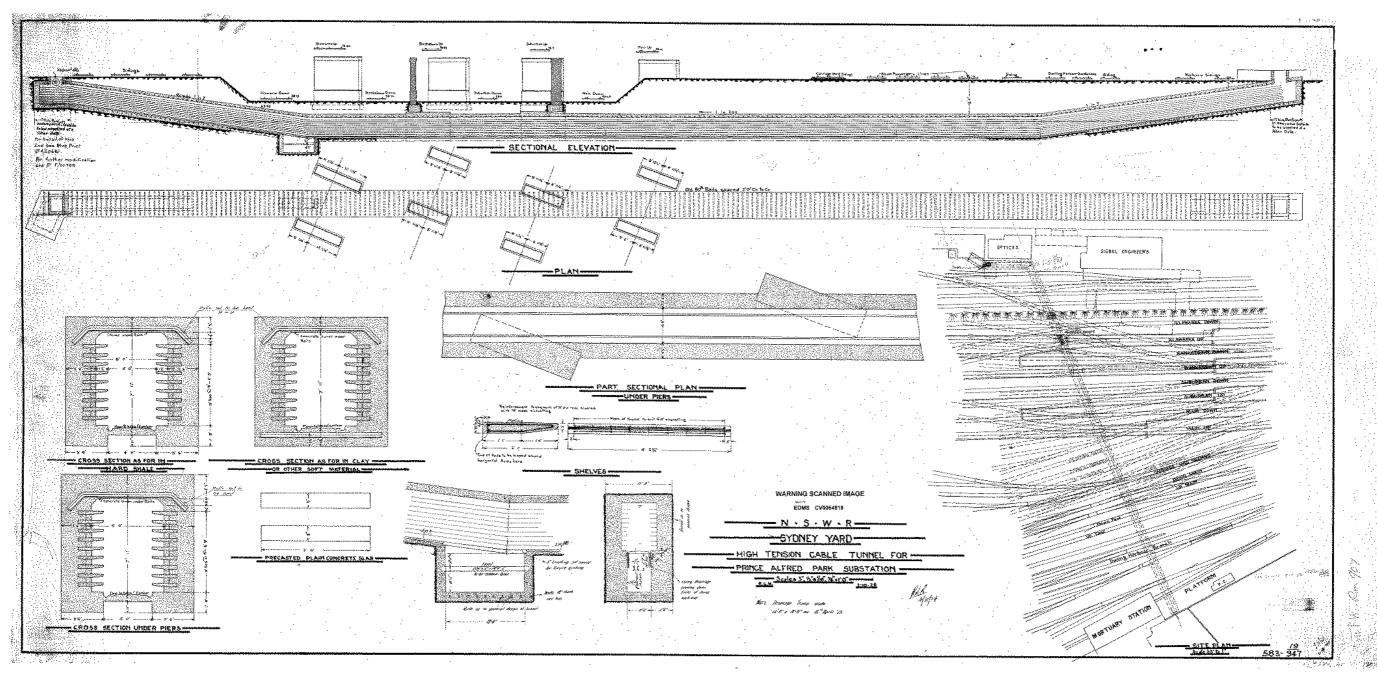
Cable Tunnel Plan for Prince Alfred Park Substation
